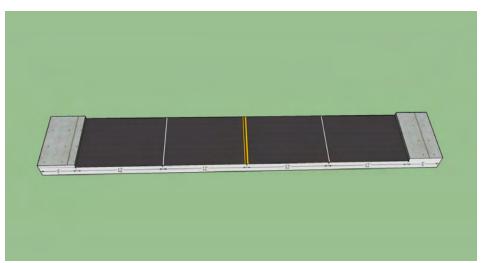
Current design of Clifton Street bridge over I-20 between East Atlanta and Kirkwood
